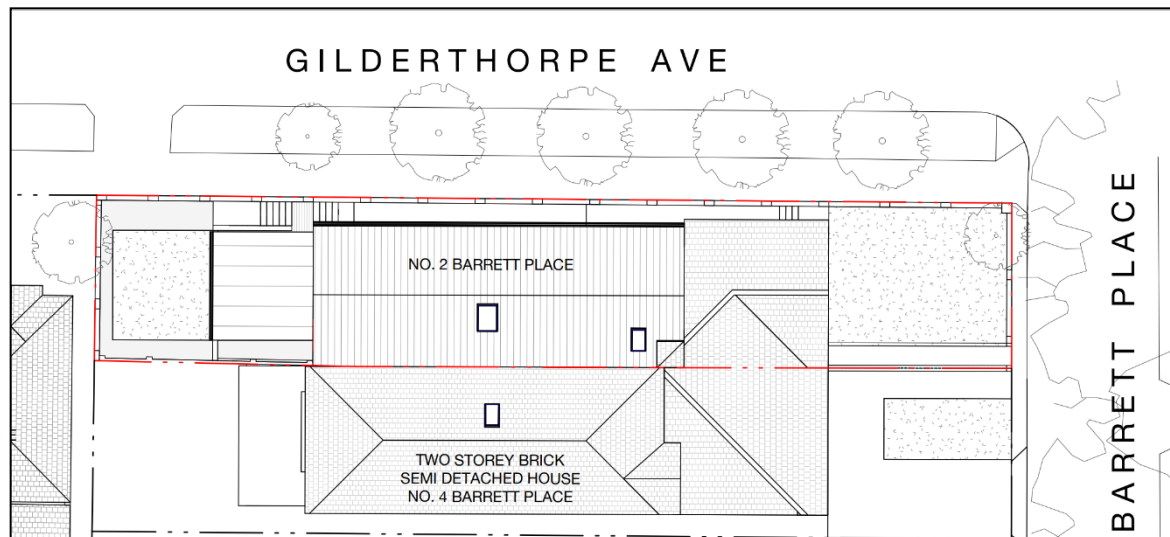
Modified site plan – 2 Barrett Place, Randwick
